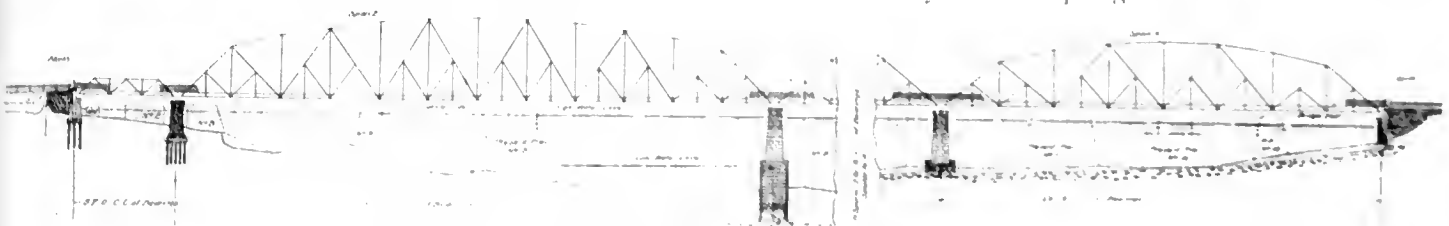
Part of side elevation Moncton Bridge showing end span—3 centre spans similar to span A not shown. Total length of bridge 1787 ft. Note relative size of present and new piers.
